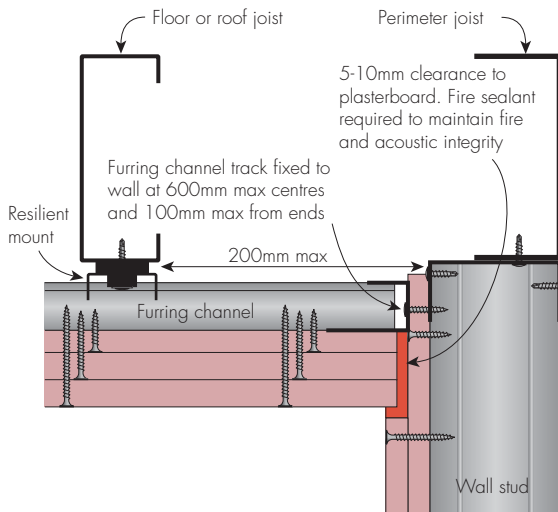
Fire Rated Ceiling to Wall – Alternate Detail
